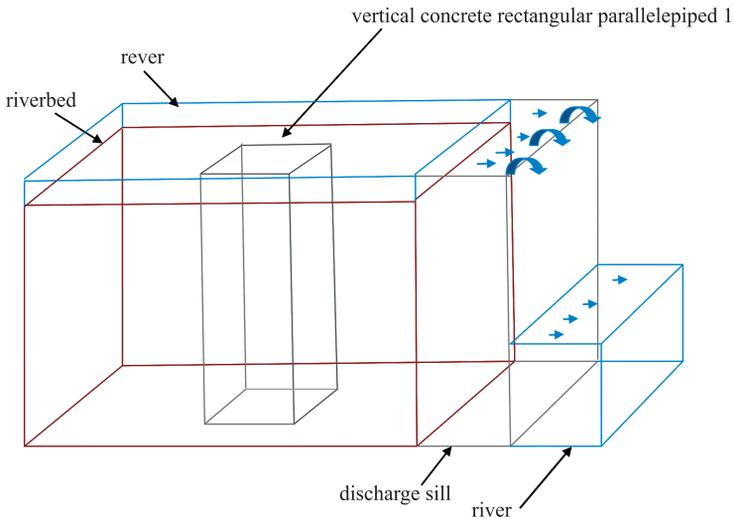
Positioning the vertical concrete rectangular parallelepiped 1 – indicative scheme
